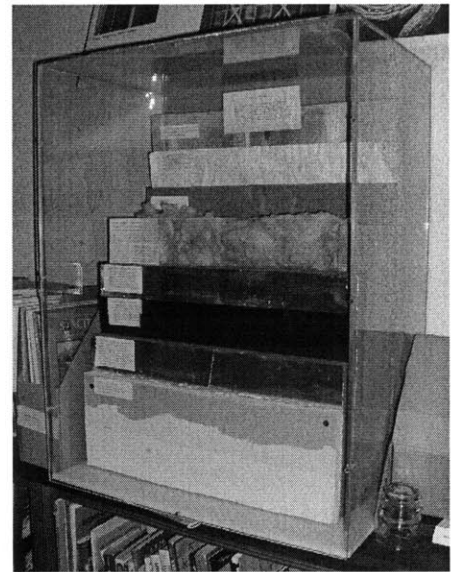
Wall cross-section. The wall features several layers of insulation for a combined wall resistance value of R-30 (R-40 in the ceilings).
